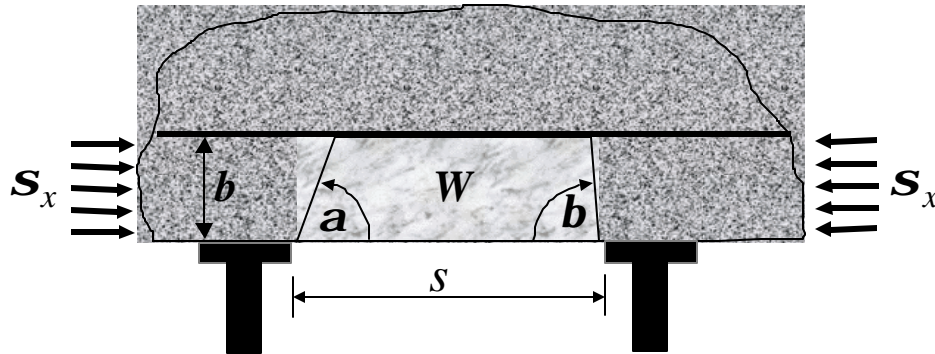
Potential keyblock instability due to shear failure at the abutments.
